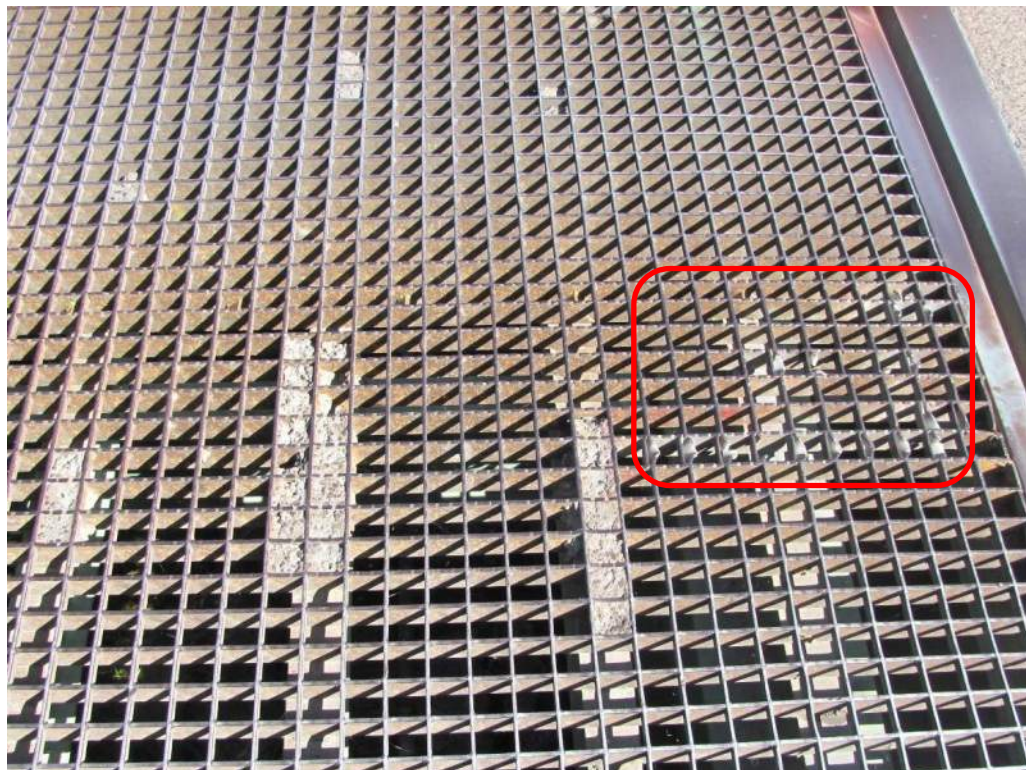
Cross bar steel repairs (in red), and concrete in voids at the east end of the deck grating.
